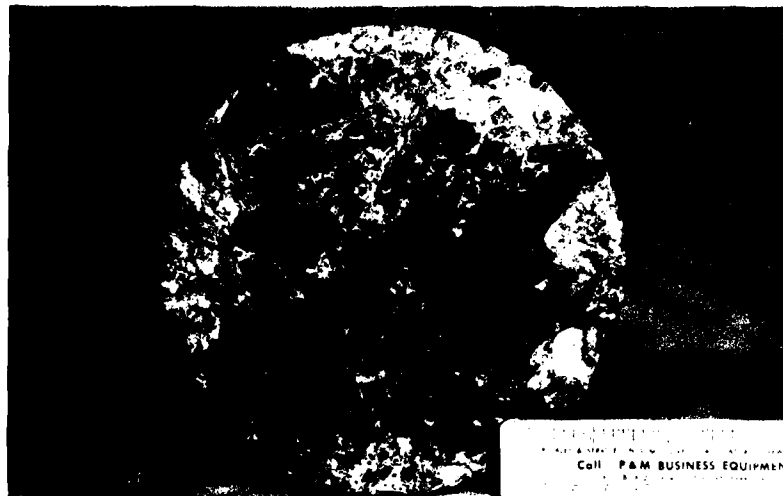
Subsurface deterioration of concrete in upper vertical face of the upper land wall gate monolith (monolith 3)
